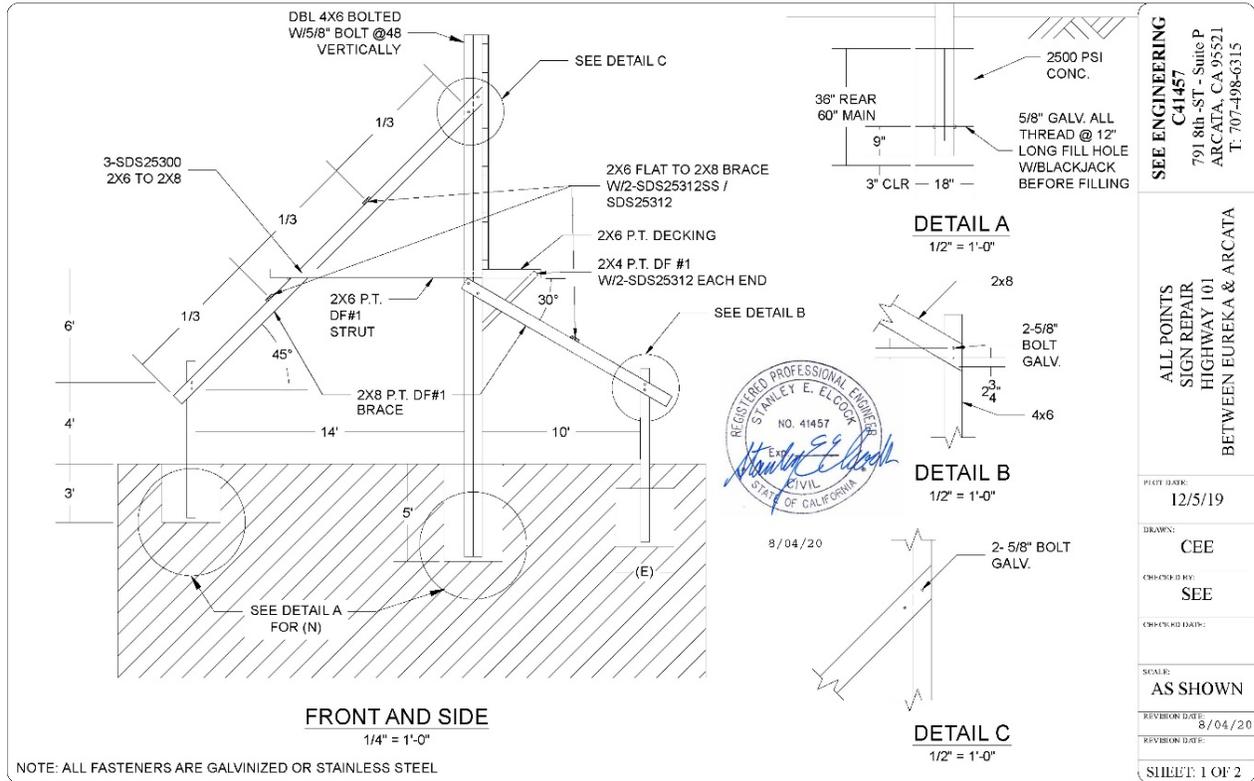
Engineered Plans for Sign Repair – Profile View showing footing & bracing detail
